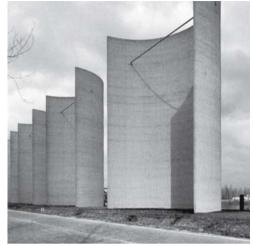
Concrete half-cylinders 25 m high (d =25 cm); the tie bars at the top guarantee the stability of the form. Maarten Struijs: windbreak in Rotterdam Harbour (NL), 1985
